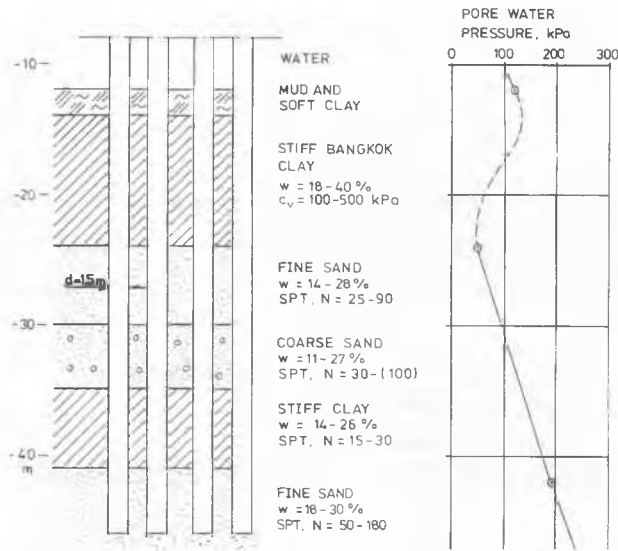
Sathorn Bridge, Foundation on Bored Piles
